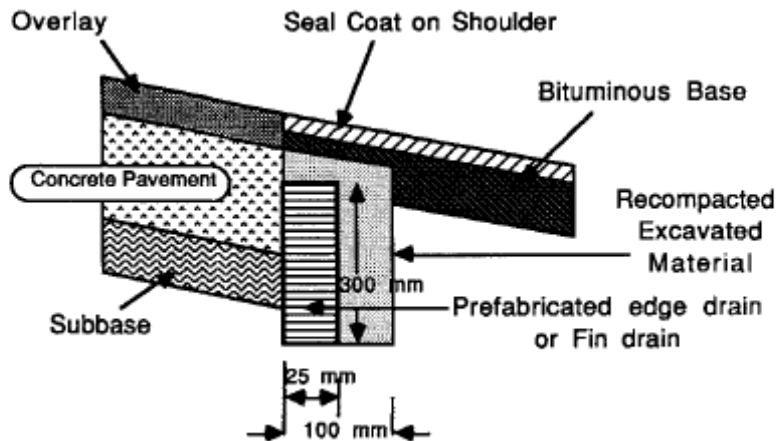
A typical cross-section of pavement with prefabricated edgedrain (ERES, 1999).
